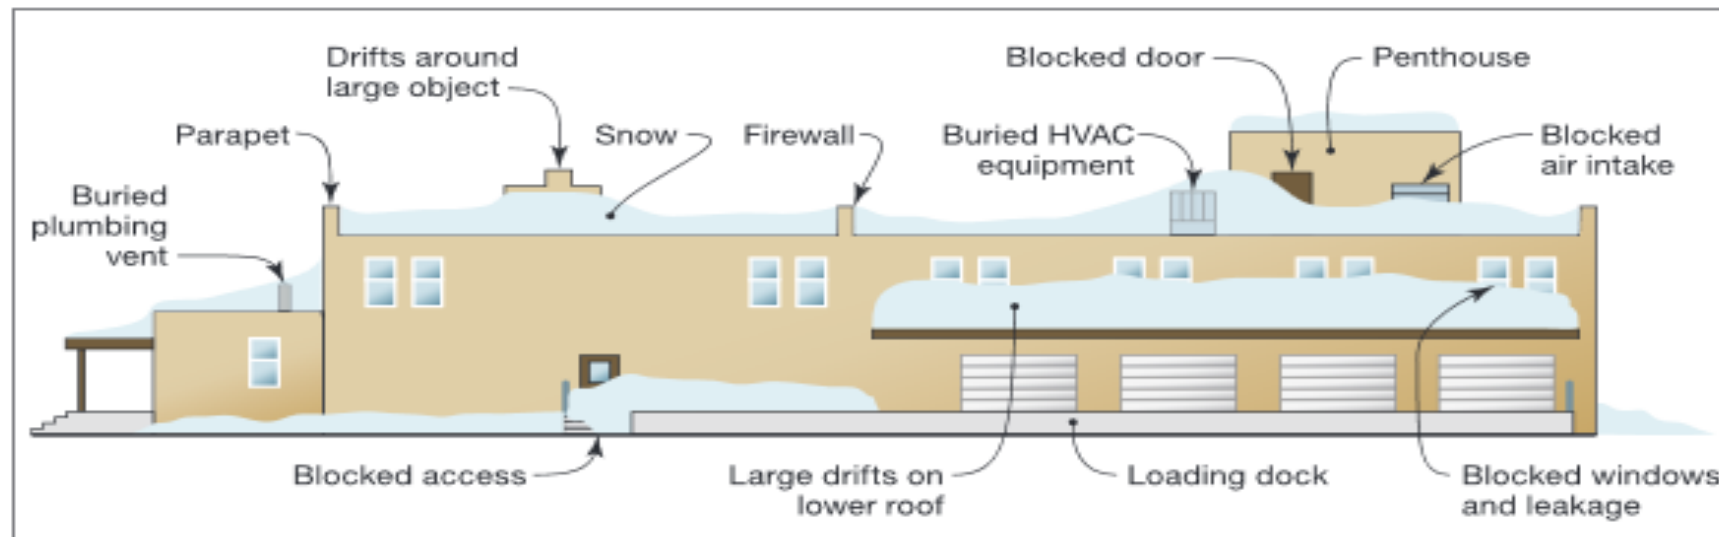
Unbalanced snow load from drifting and sliding snow on typical commercial or industrial building
